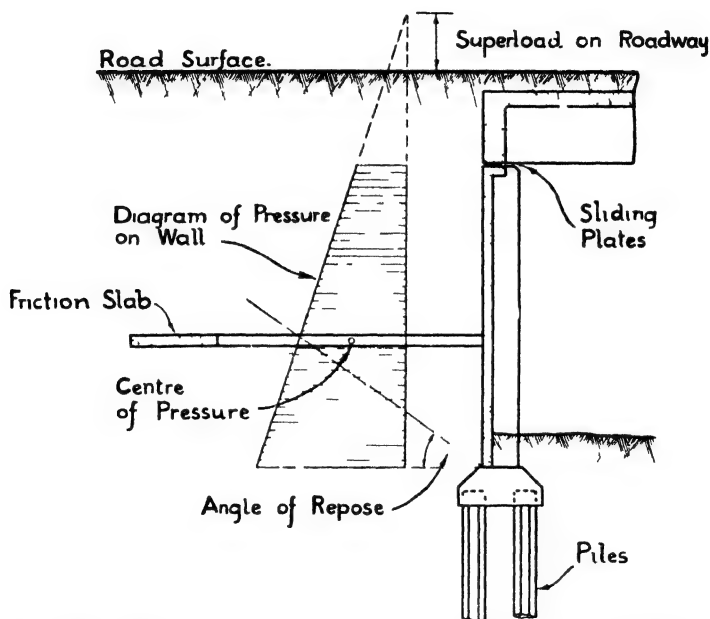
Abutment Retaining Wall of Girder Bridge carried upon Piles.
